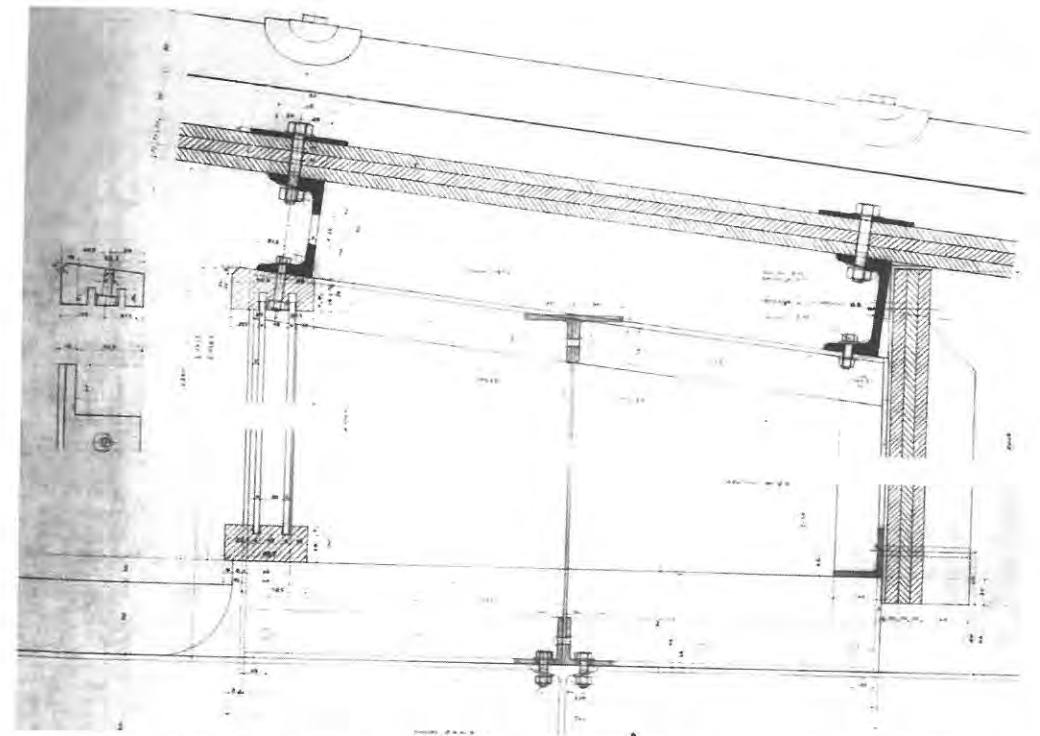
Jean Prouvé's own house, Nancy, 1954. Roof detail. (© Centre Pompidou, Bibliothèque Kandinsky)
